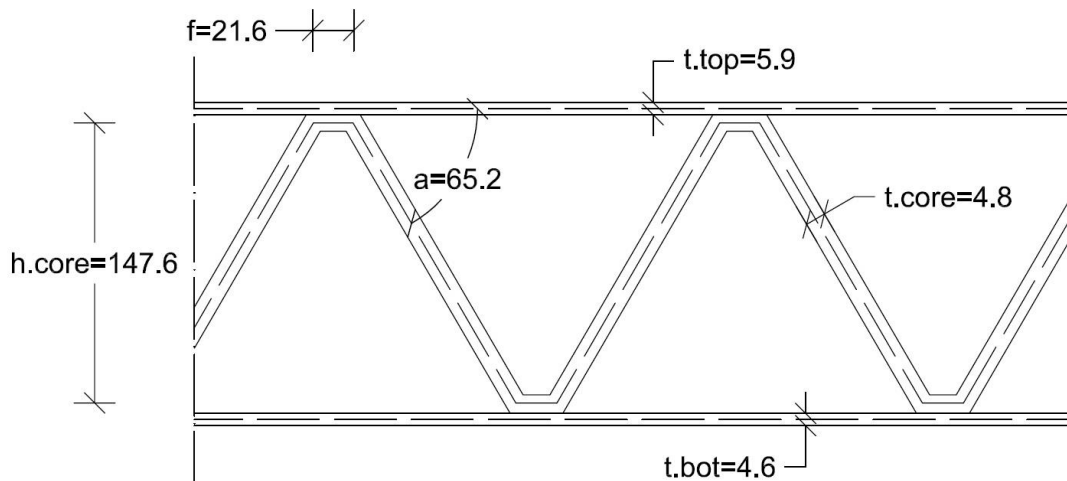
Final cross-section of the new steel sandwich element that minimizes the material used.
